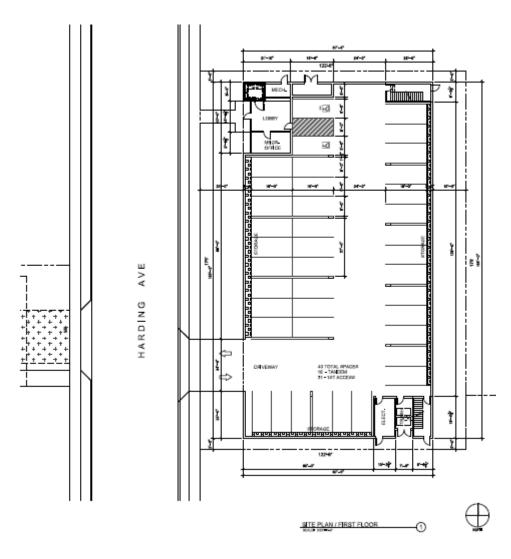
SITE PLAN FOR PHASE 2 (HARDING AVE.) SOURCE: John Cotton Architects, Inc.
